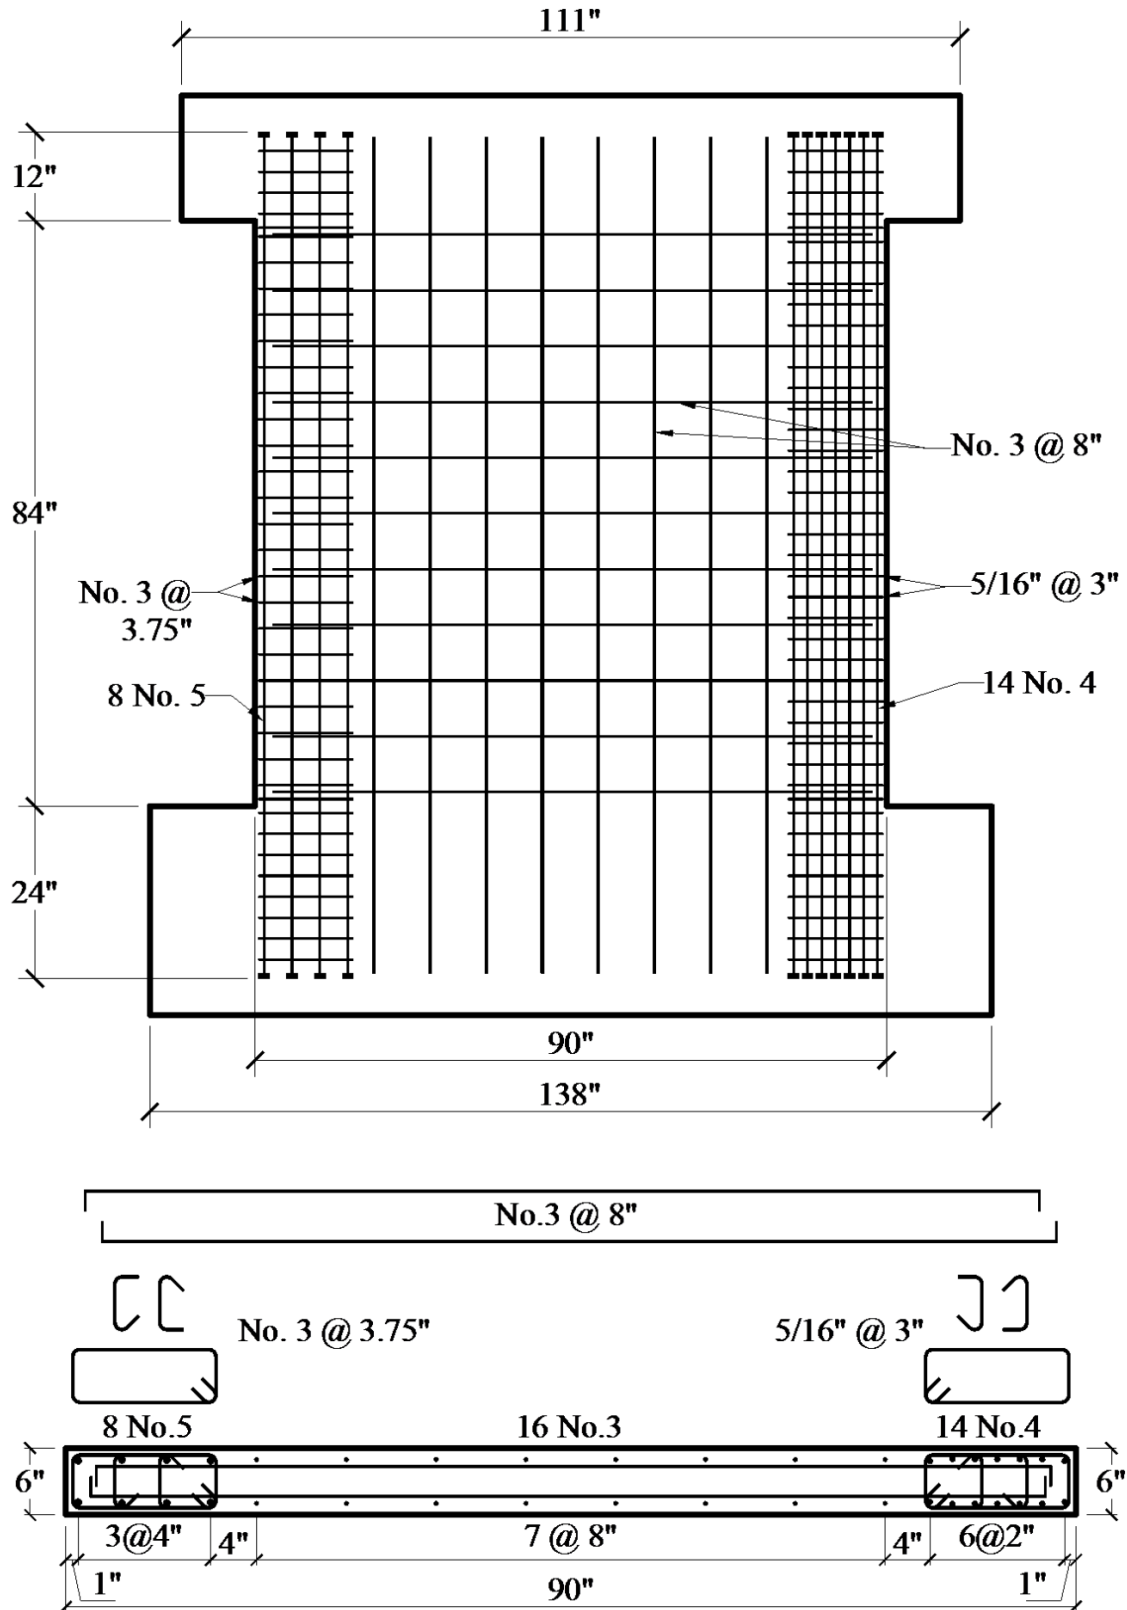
Specimen WP3 reinforcement (Conversion: 1"=25.4 mm)
